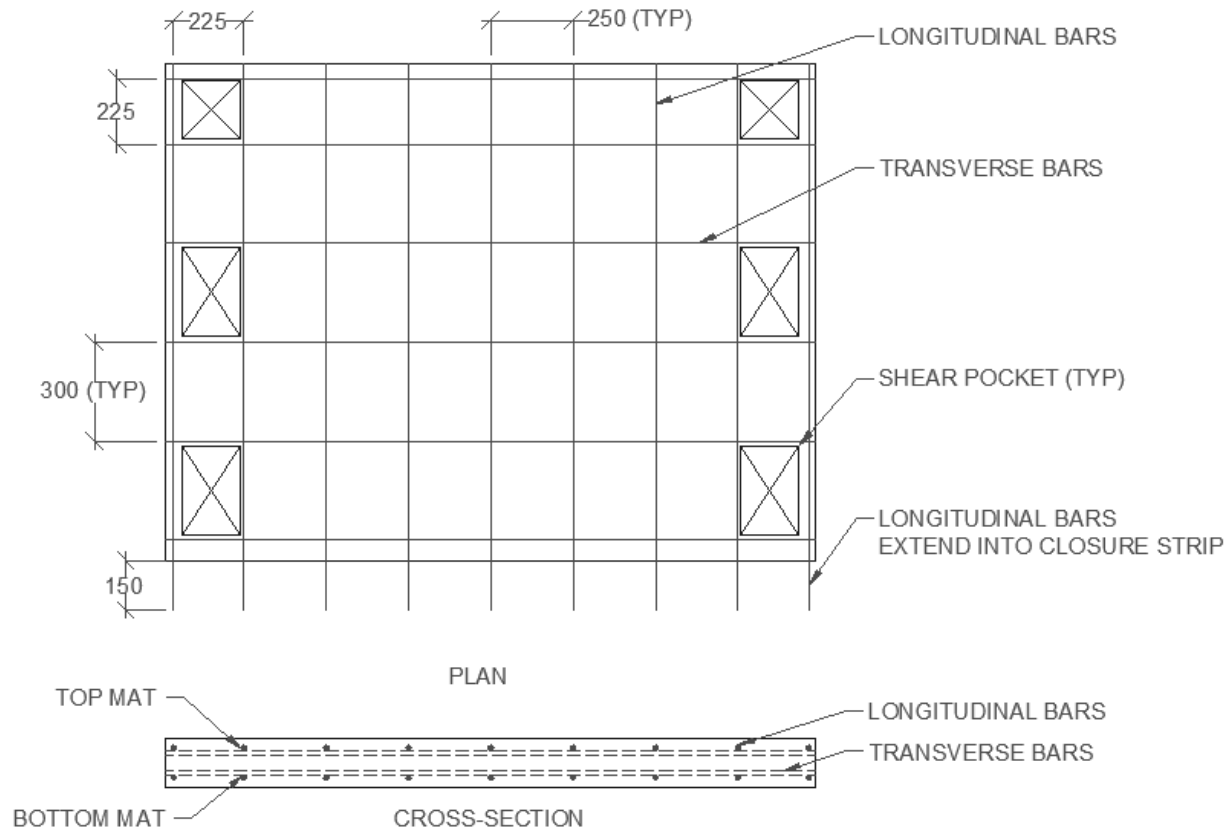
Reinforcement layout for panel (plan view and cross-section), mirrored top and bottom.
